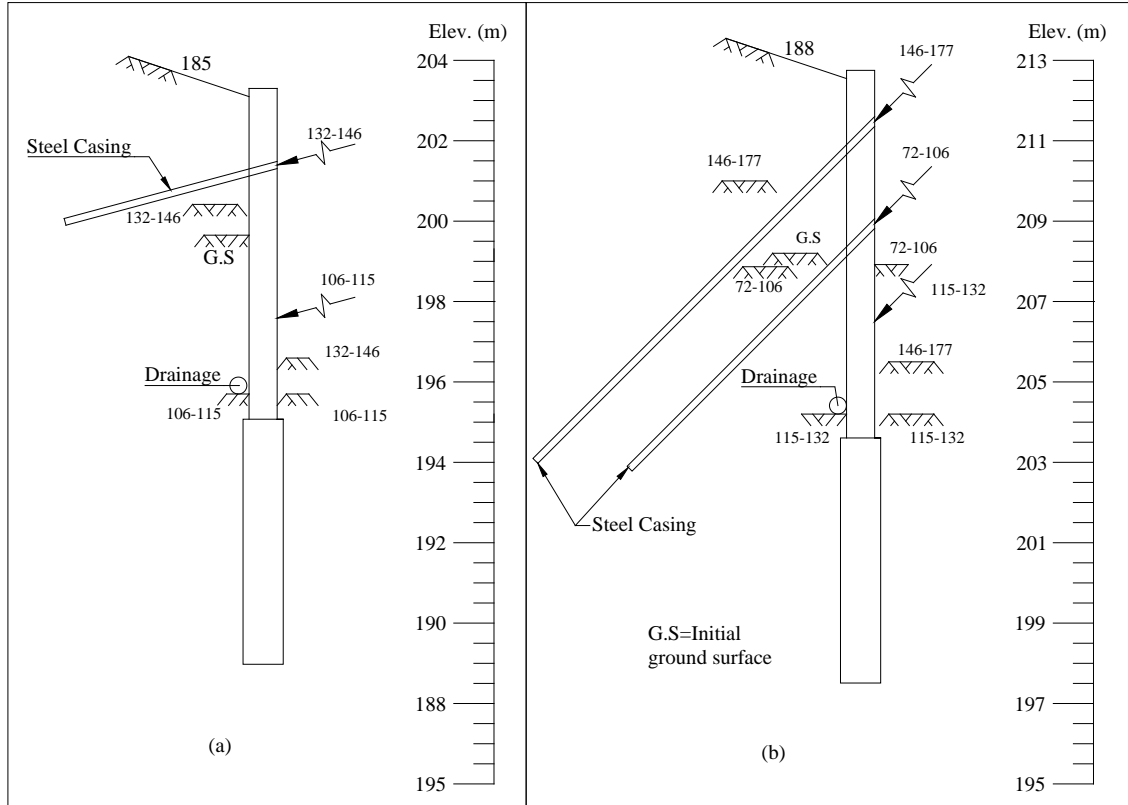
Sequence of Installation of the anchors: (a) Lower wall; (b) Upper wall
